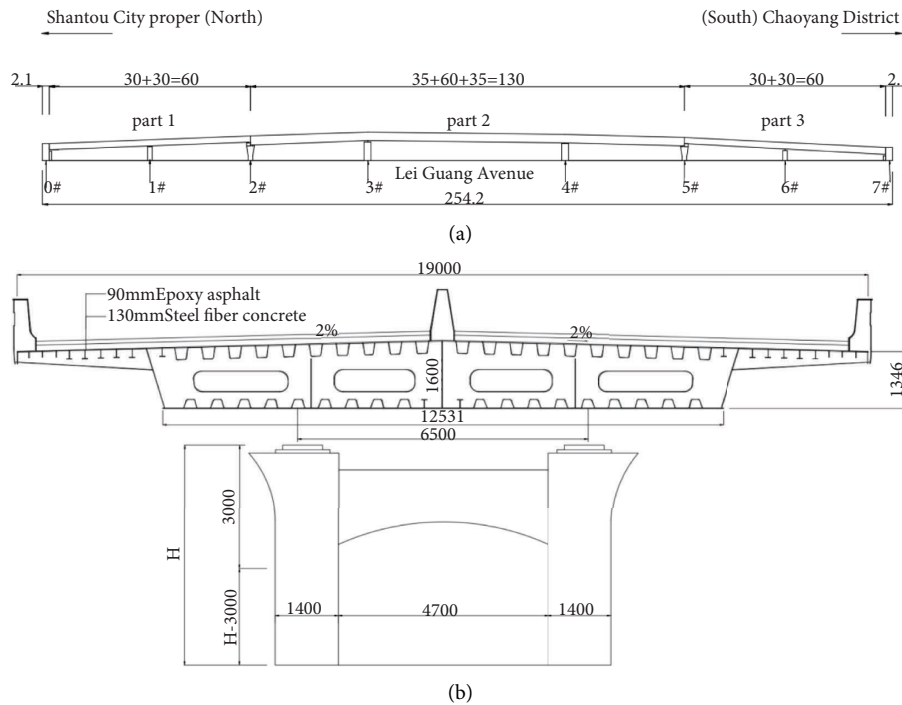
Layout of Leiguang Bridge and cross section of steel box girder. (a) Bridge elevation (unit: m). (b) Cross section of steel box girder and double-column pier (unit: mm).
